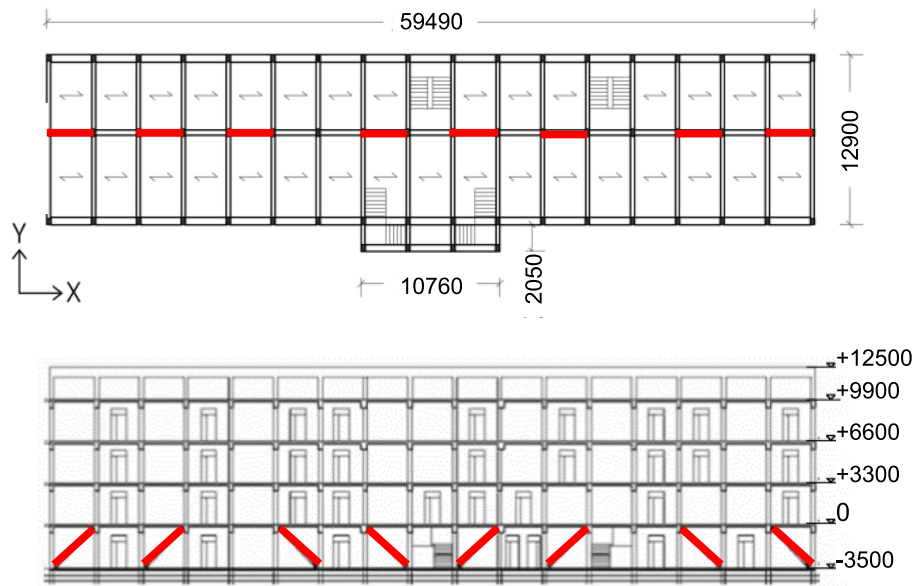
Structural plan of the above-ground storeys and longitudinal section of the building (dimensions in mm), with highlighted in red the conventional steel braces installed in 2005. (For interpretation of the references to colour in this figure legend, the reader is referred to the web version of this article.)
